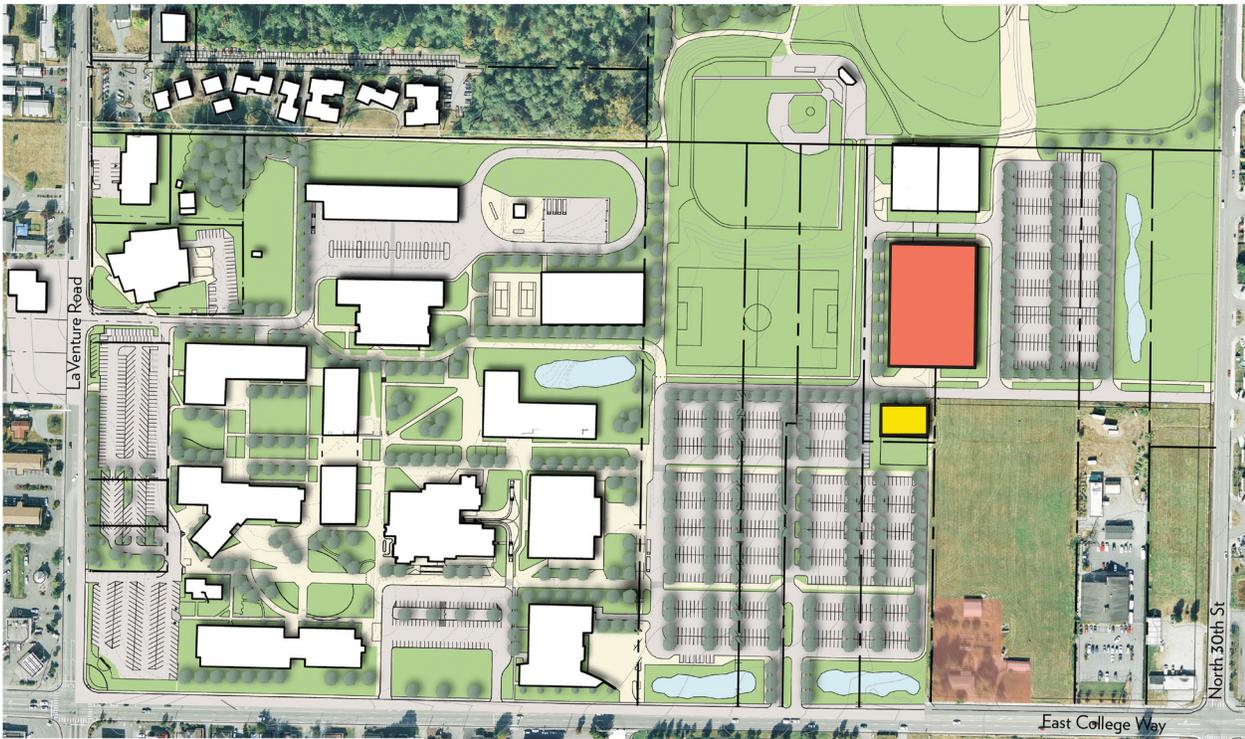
SVC Master Plan Long Term Development Plan (unmodified)
